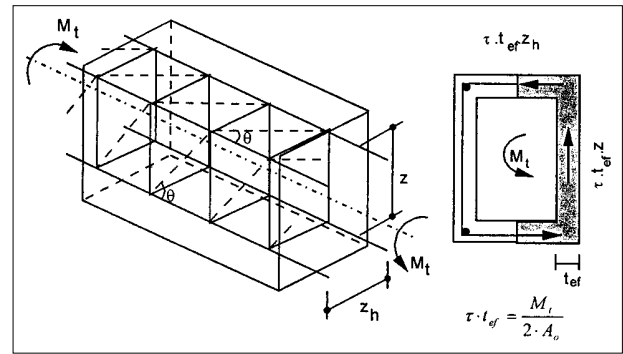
Truss model for the analysis of concrete beams under torsion.
